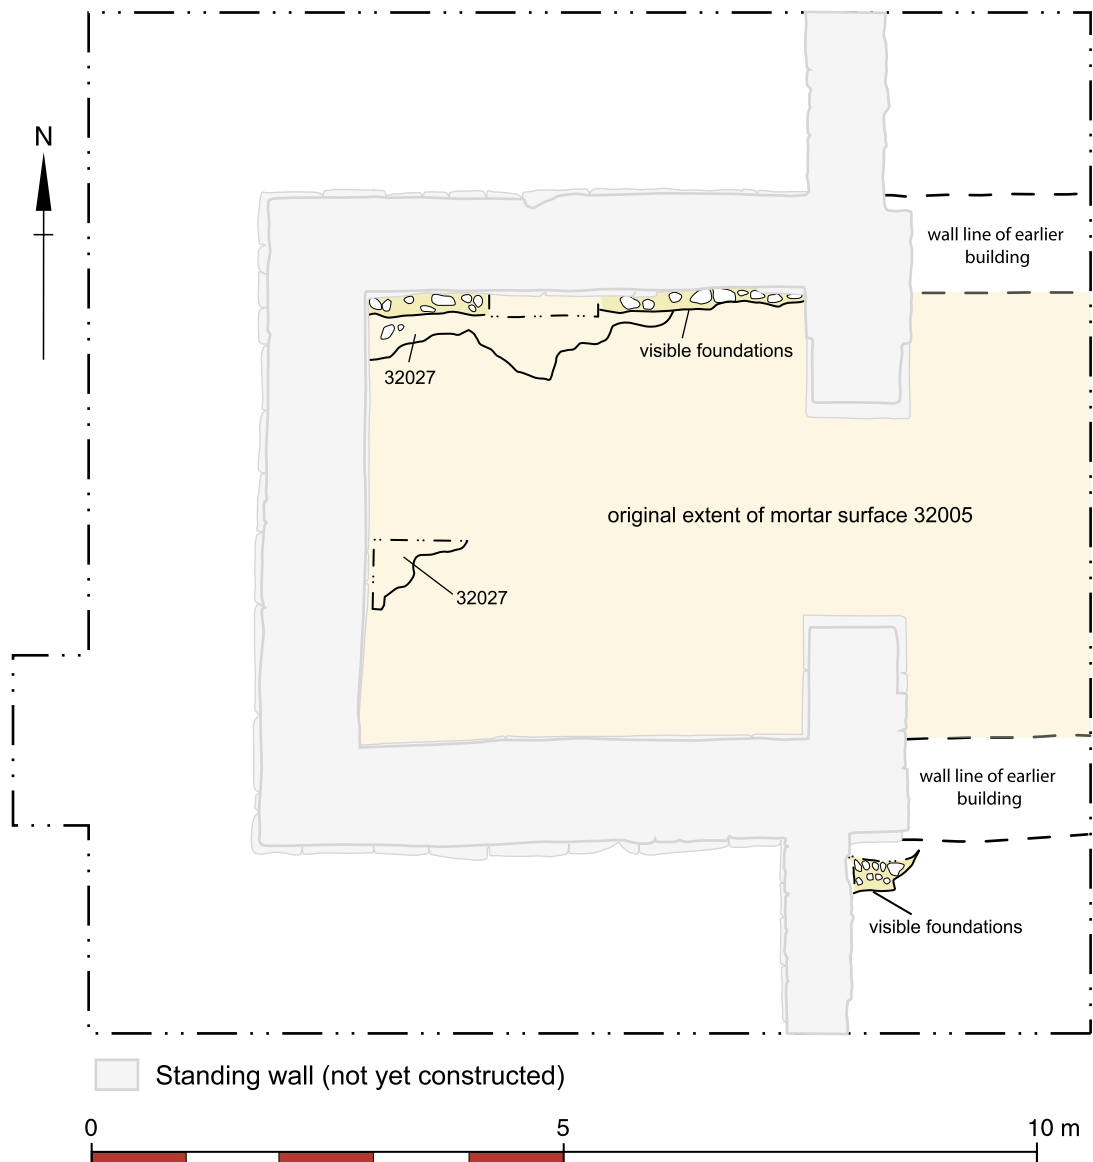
Construction of earlier building (Trench 1). Scale 1:80
